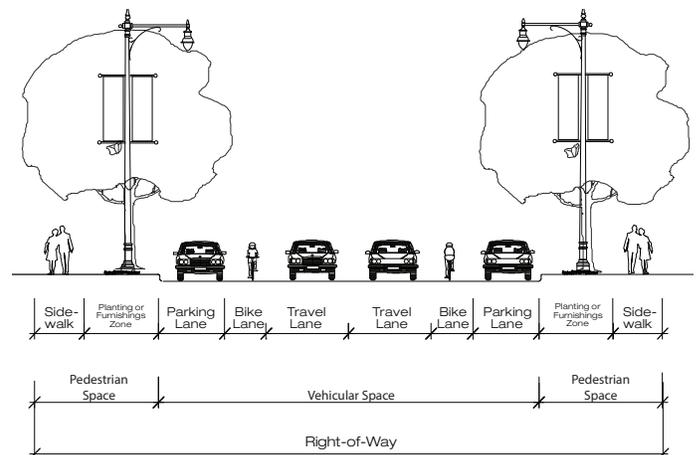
(1). Typical Right-of-Way (Property Line to Property Line) Elements.
